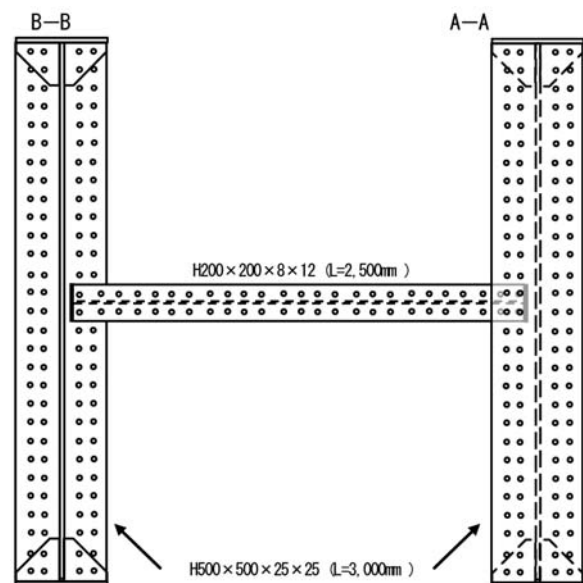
Specimen for Bearing Beam Joint Static Loading Tests (plan)
